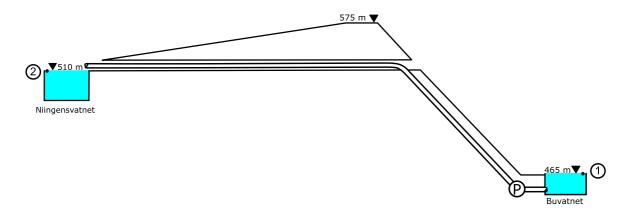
A simplified side-view illustration shows the lengths and elevations of the pumping plan from Buvatnet to Niingensvatnet with a tunnel
